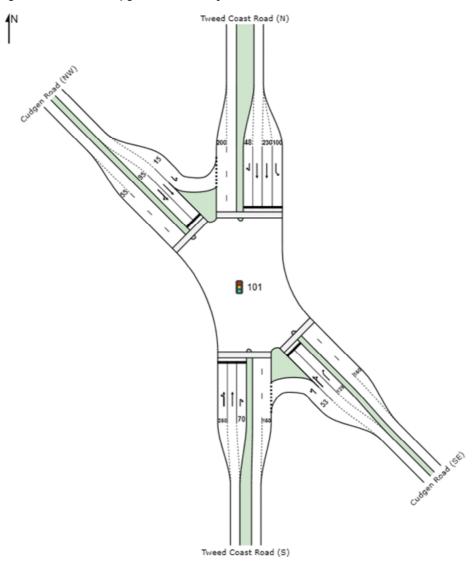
Tweed Coast Road / Cudgen Road SIDRA Intersection Layout – Upgrade 2
